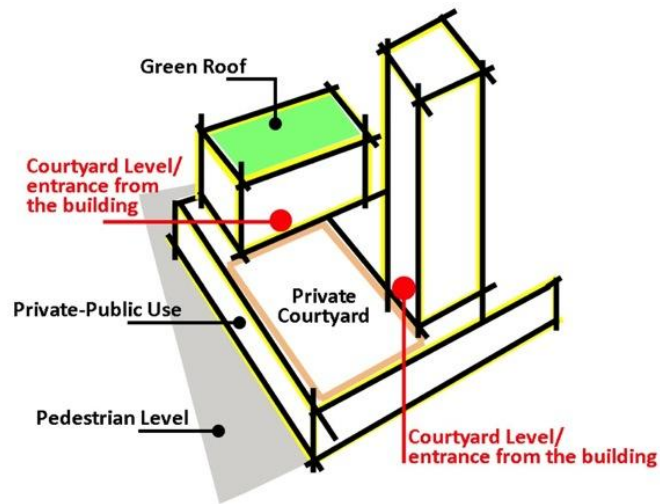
Tall buildings require a broad range of private open spaces to meet the needs of building occupants (Adapted and Re-drawn; Tall Building Design Guidelines, 2013)
